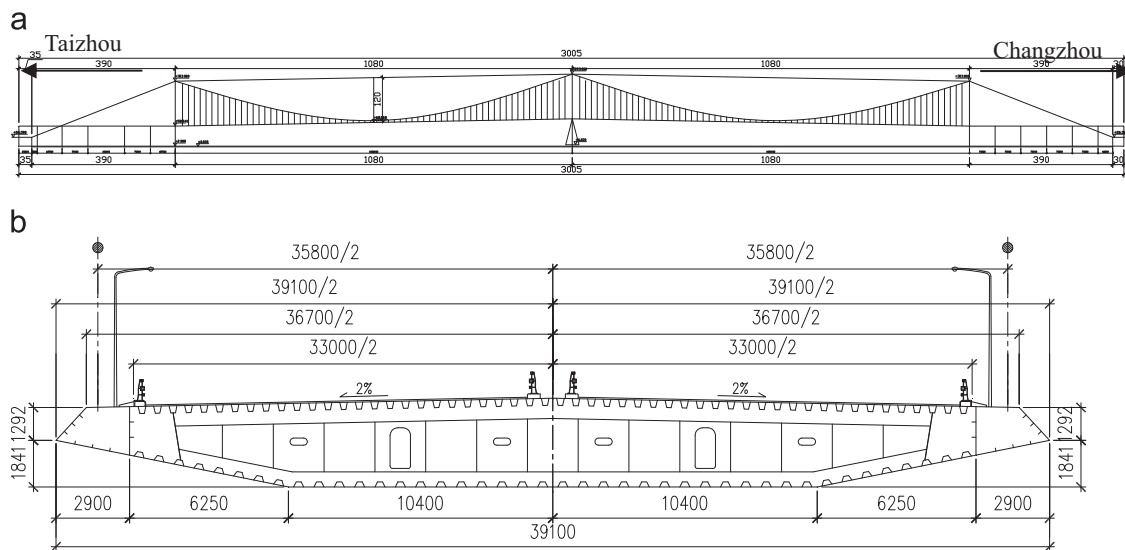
Schematic description of Taizhou Bridge: (a) elevation (unit: m) and (b) section of the girder (unit: cm).
